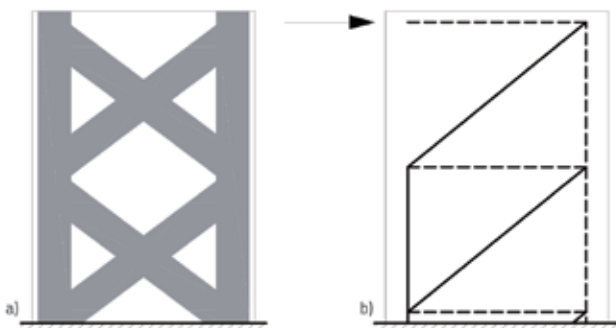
An example of masonry wall strengthening a) layout of strips; b) static scheme
